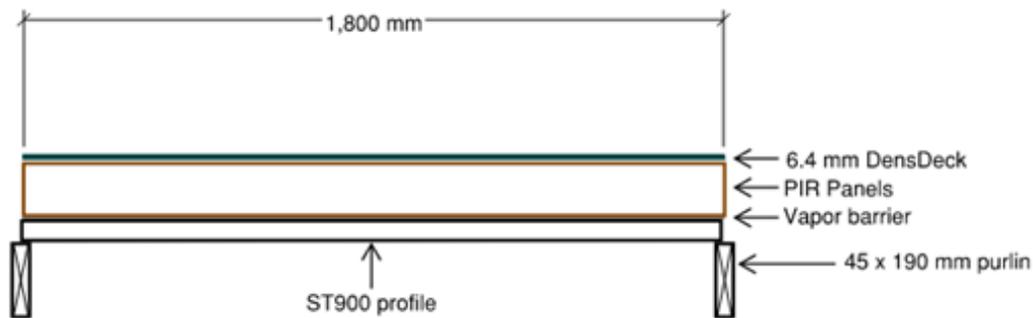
Viking Roofspec roof build up on ST900 steel roofing
